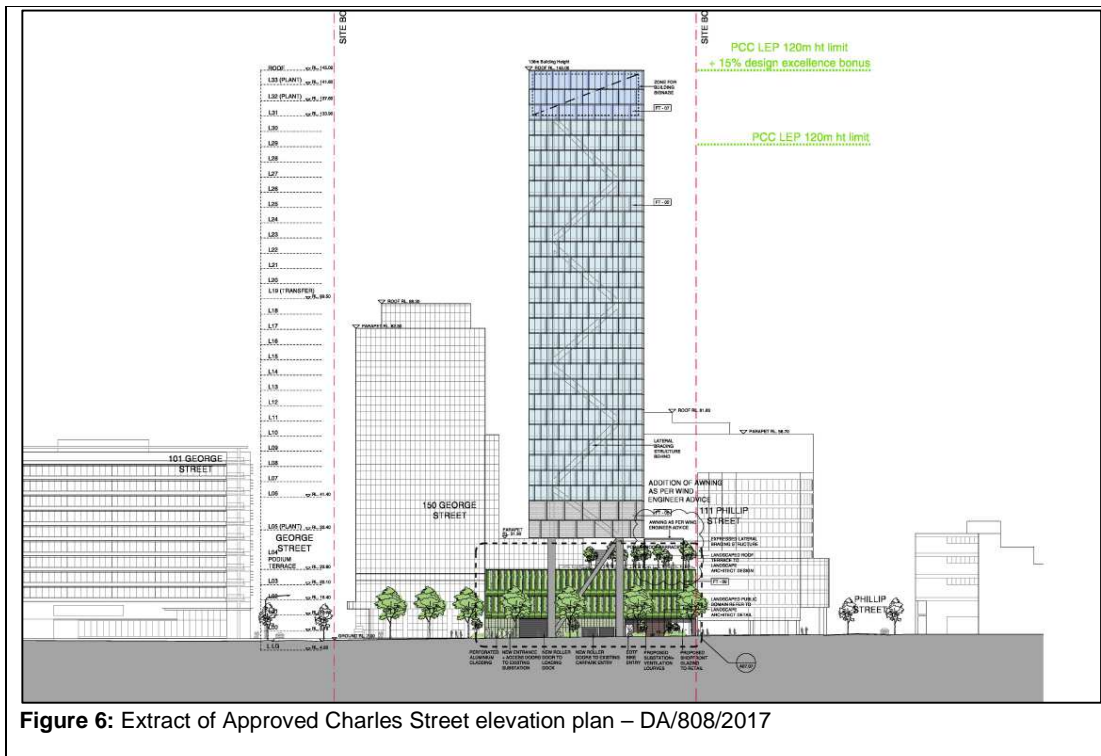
Extract of Approved Charles Street elevation plan – DA/808/2017
